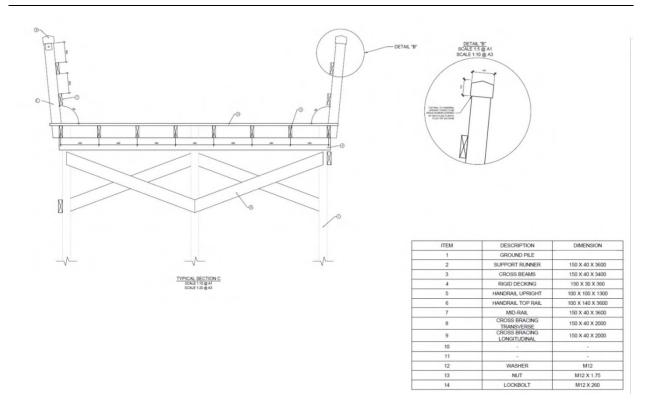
Typical Construction of Recycled Plastic Boardwalk (Away from Road)
